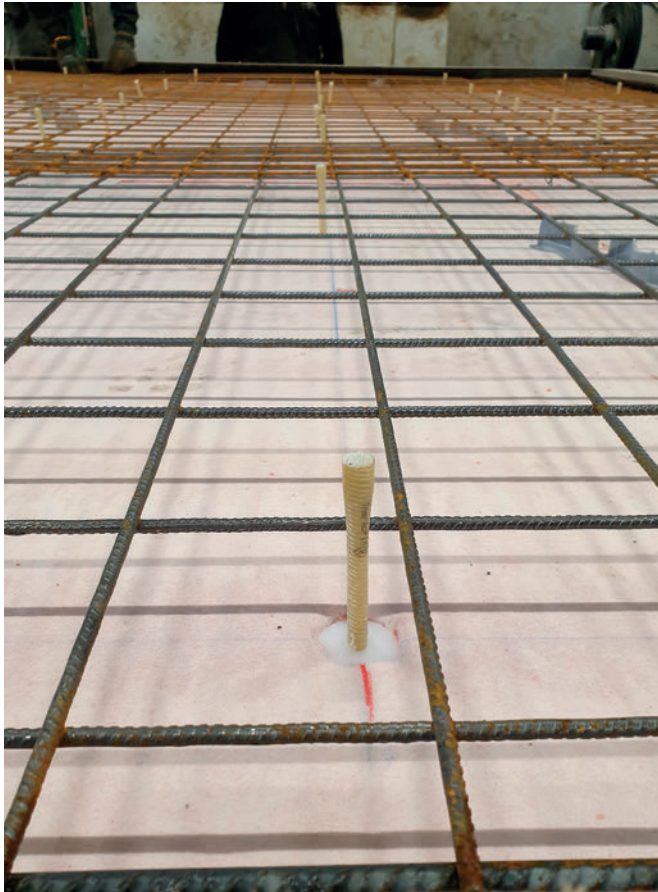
Installation of the ThermoPin from BT innovation in the concrete plant - horizontal bar
